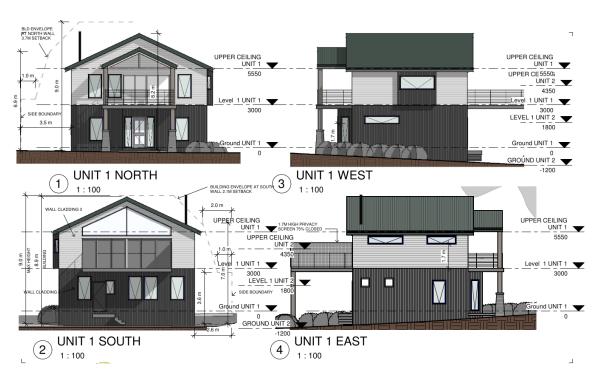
Shows the dwelling 1 (unit 1) elevations.
